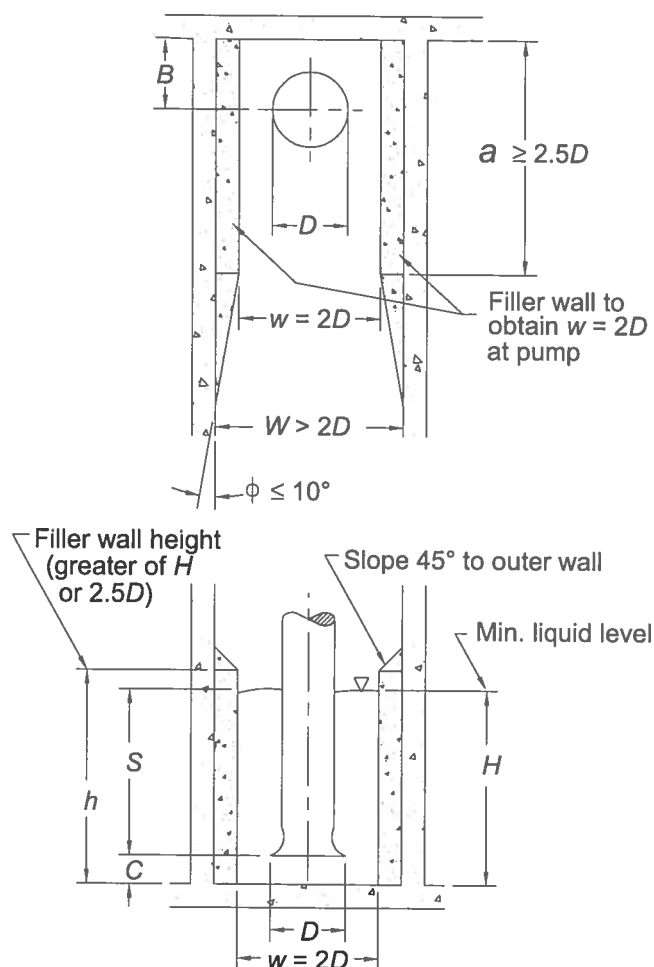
Filler wall details for proper bay width
